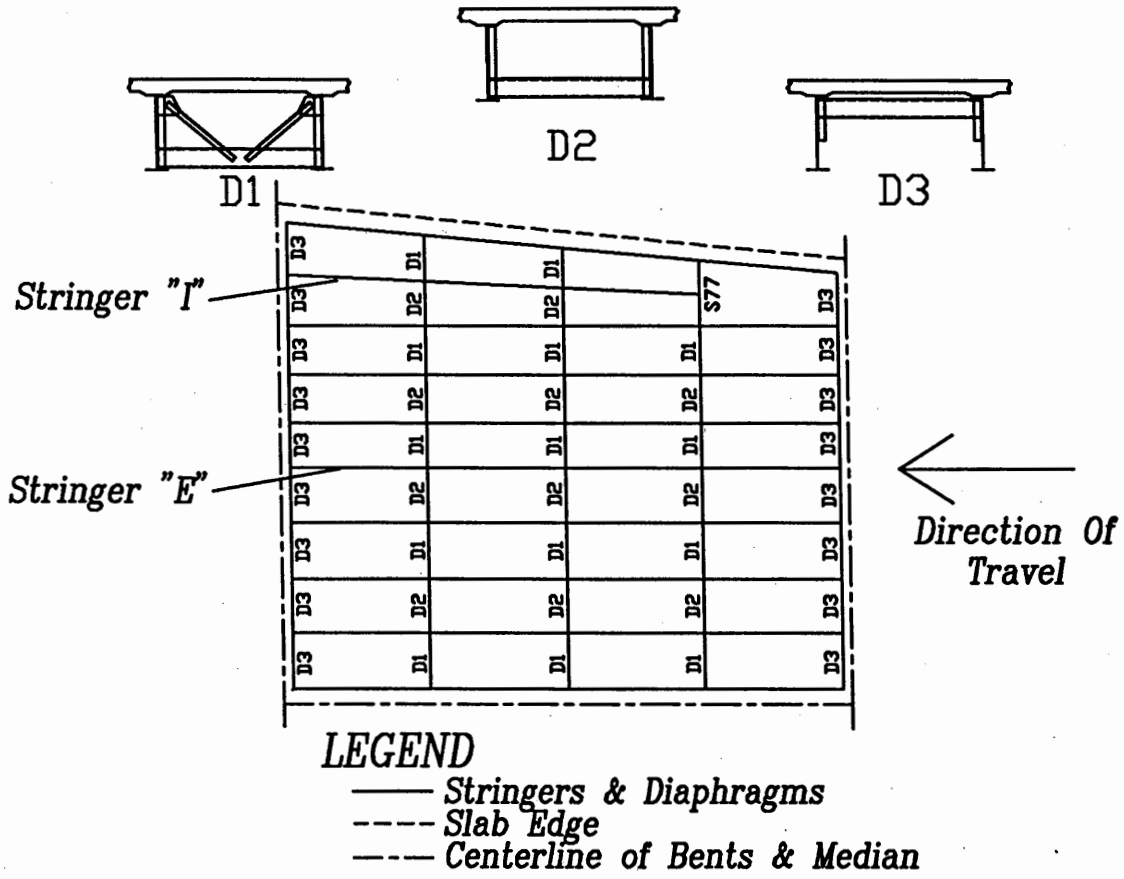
PLAN VIEW OF SPAN SHOWING LOADING.
